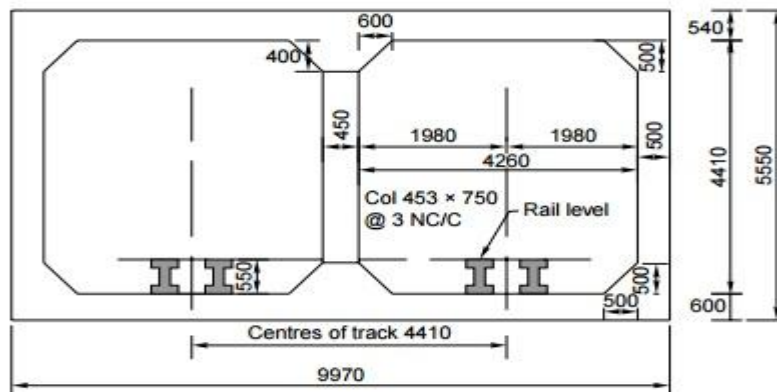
Typical cross section of an underground railway (cut and cover method); all dimensions in mm
